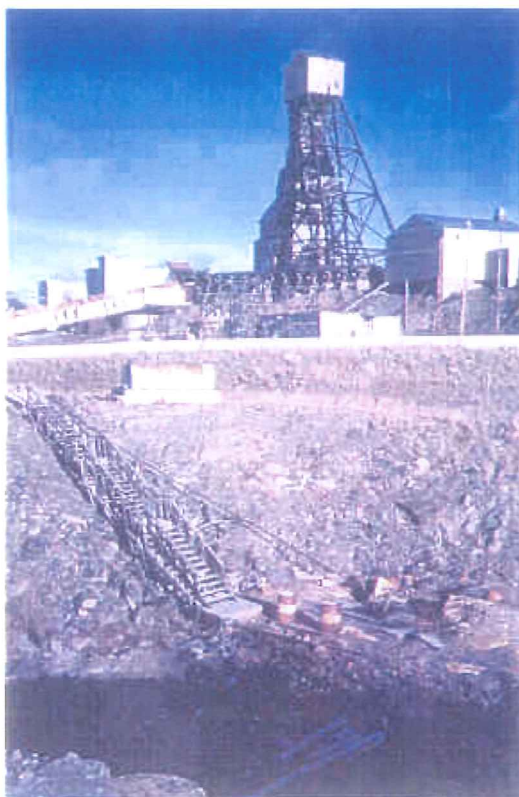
C1 Pit, north end, looking north-east, towards C Shaft. Showing the top of the emergency escape-way from underground.
